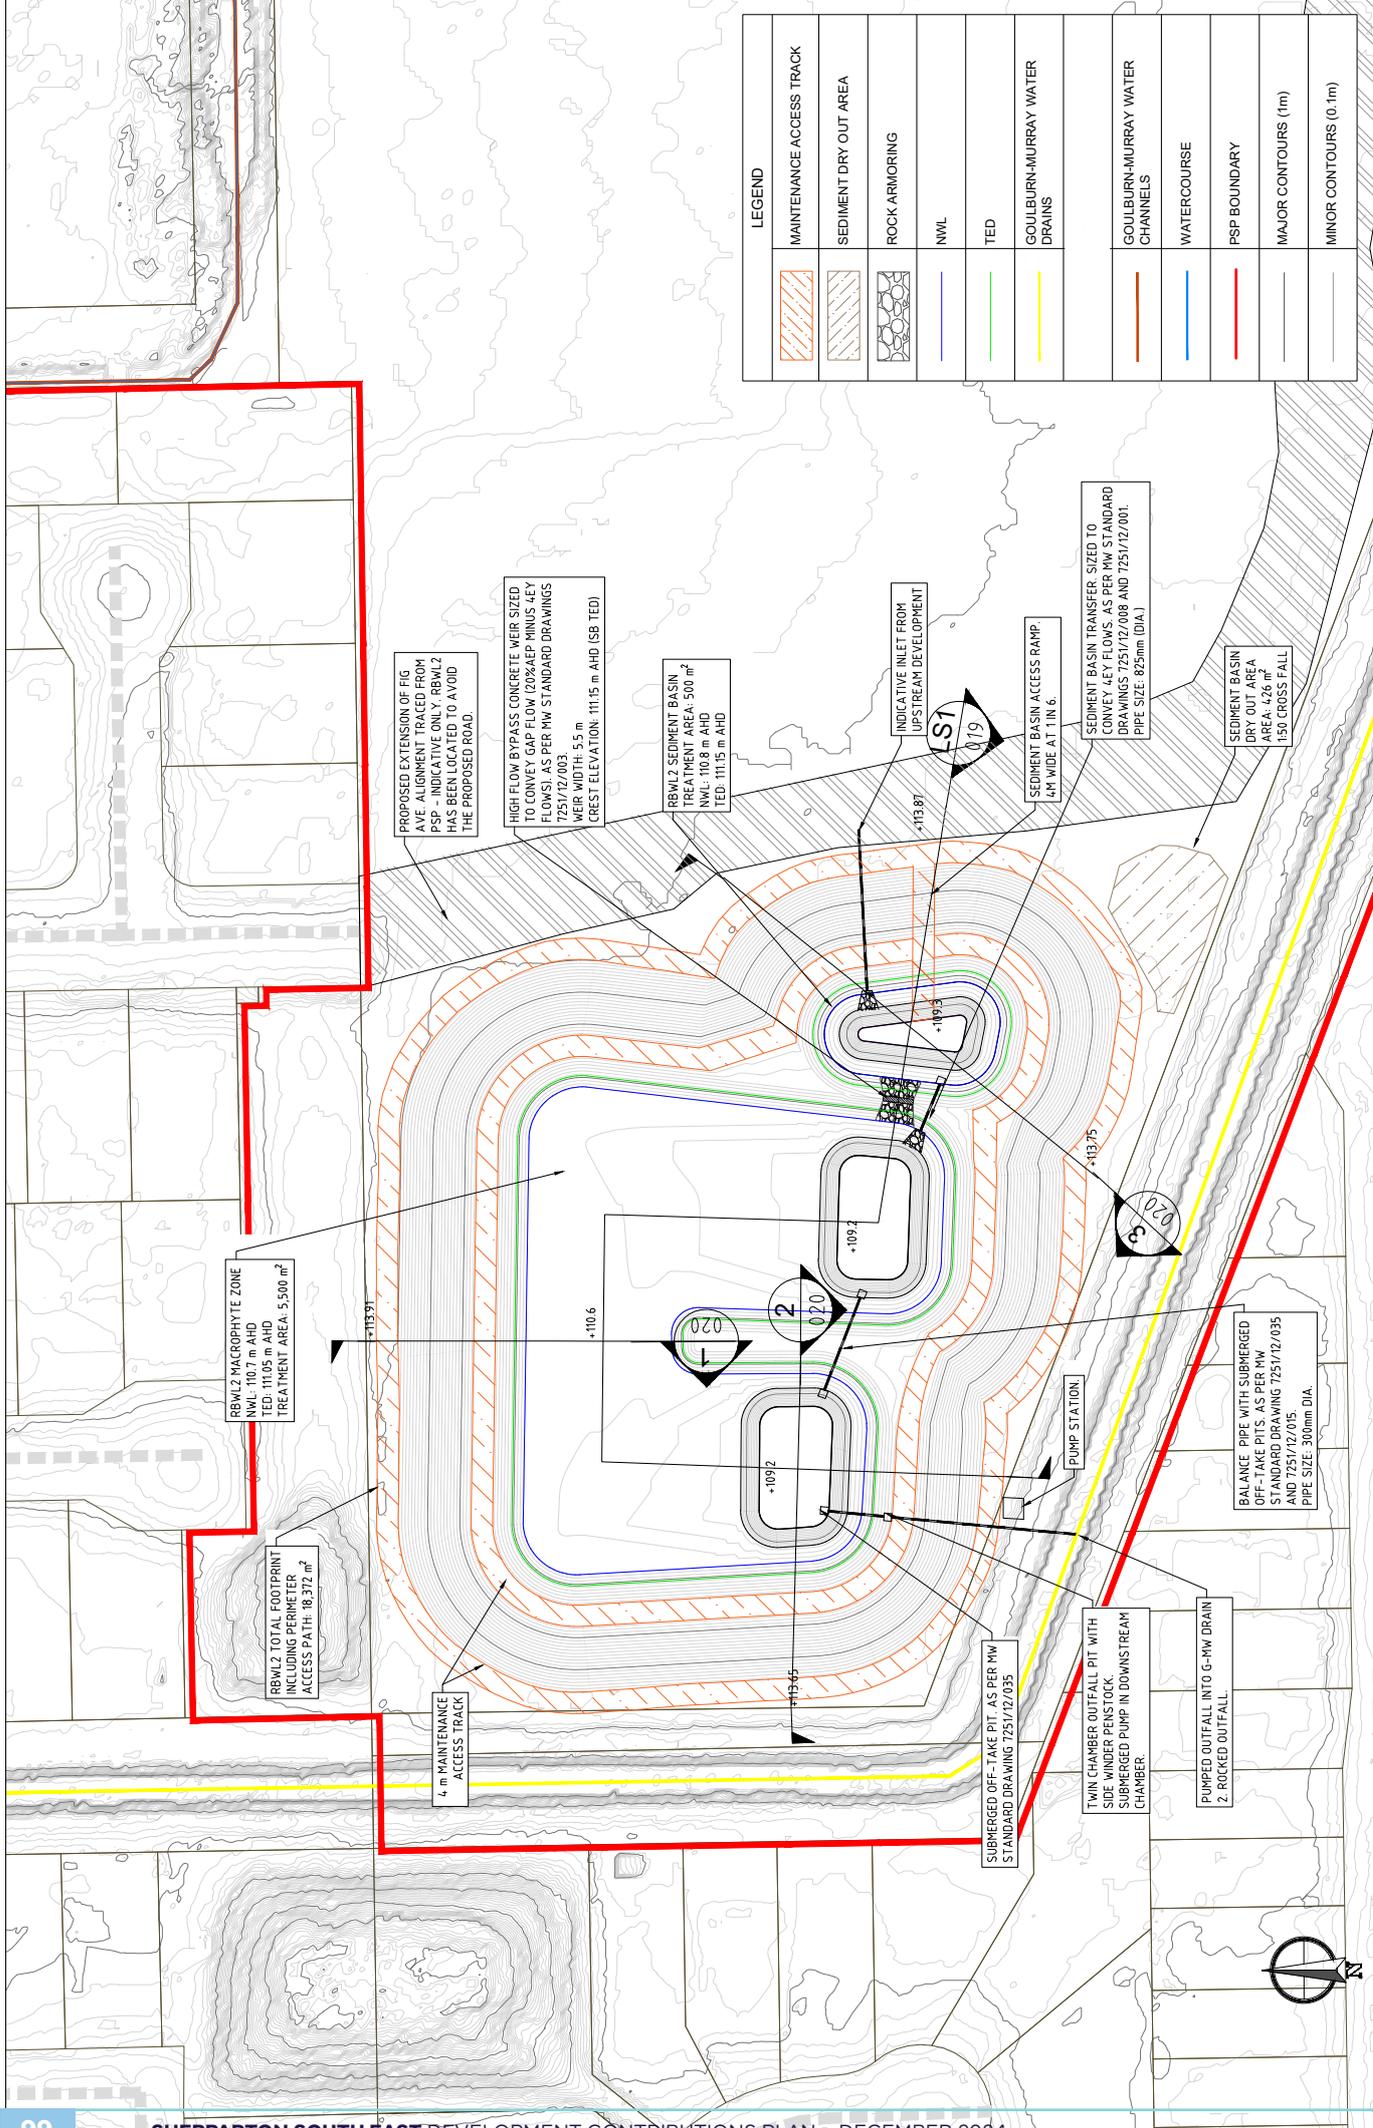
Concept Layout - Alternative Arrangement for RBWL1a and RBWL1b
